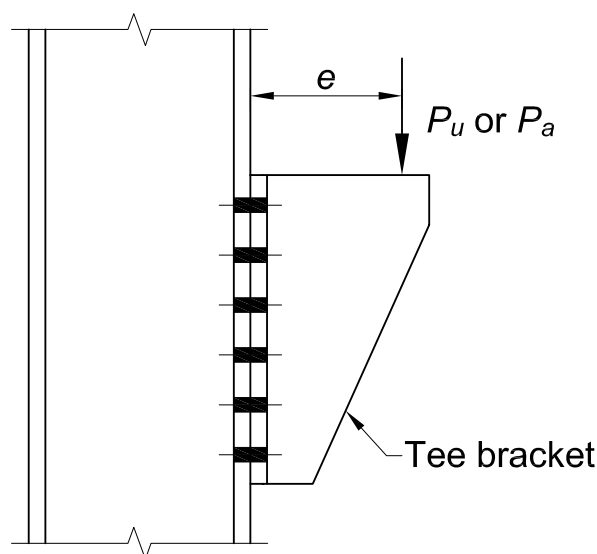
Tee bracket subject to eccentric loading normal to the plane of the faying surface.
